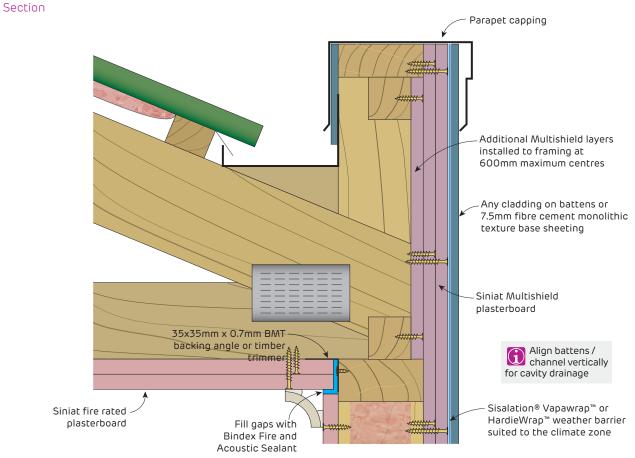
External Timber Wall to Non-combustible Roof Lining
